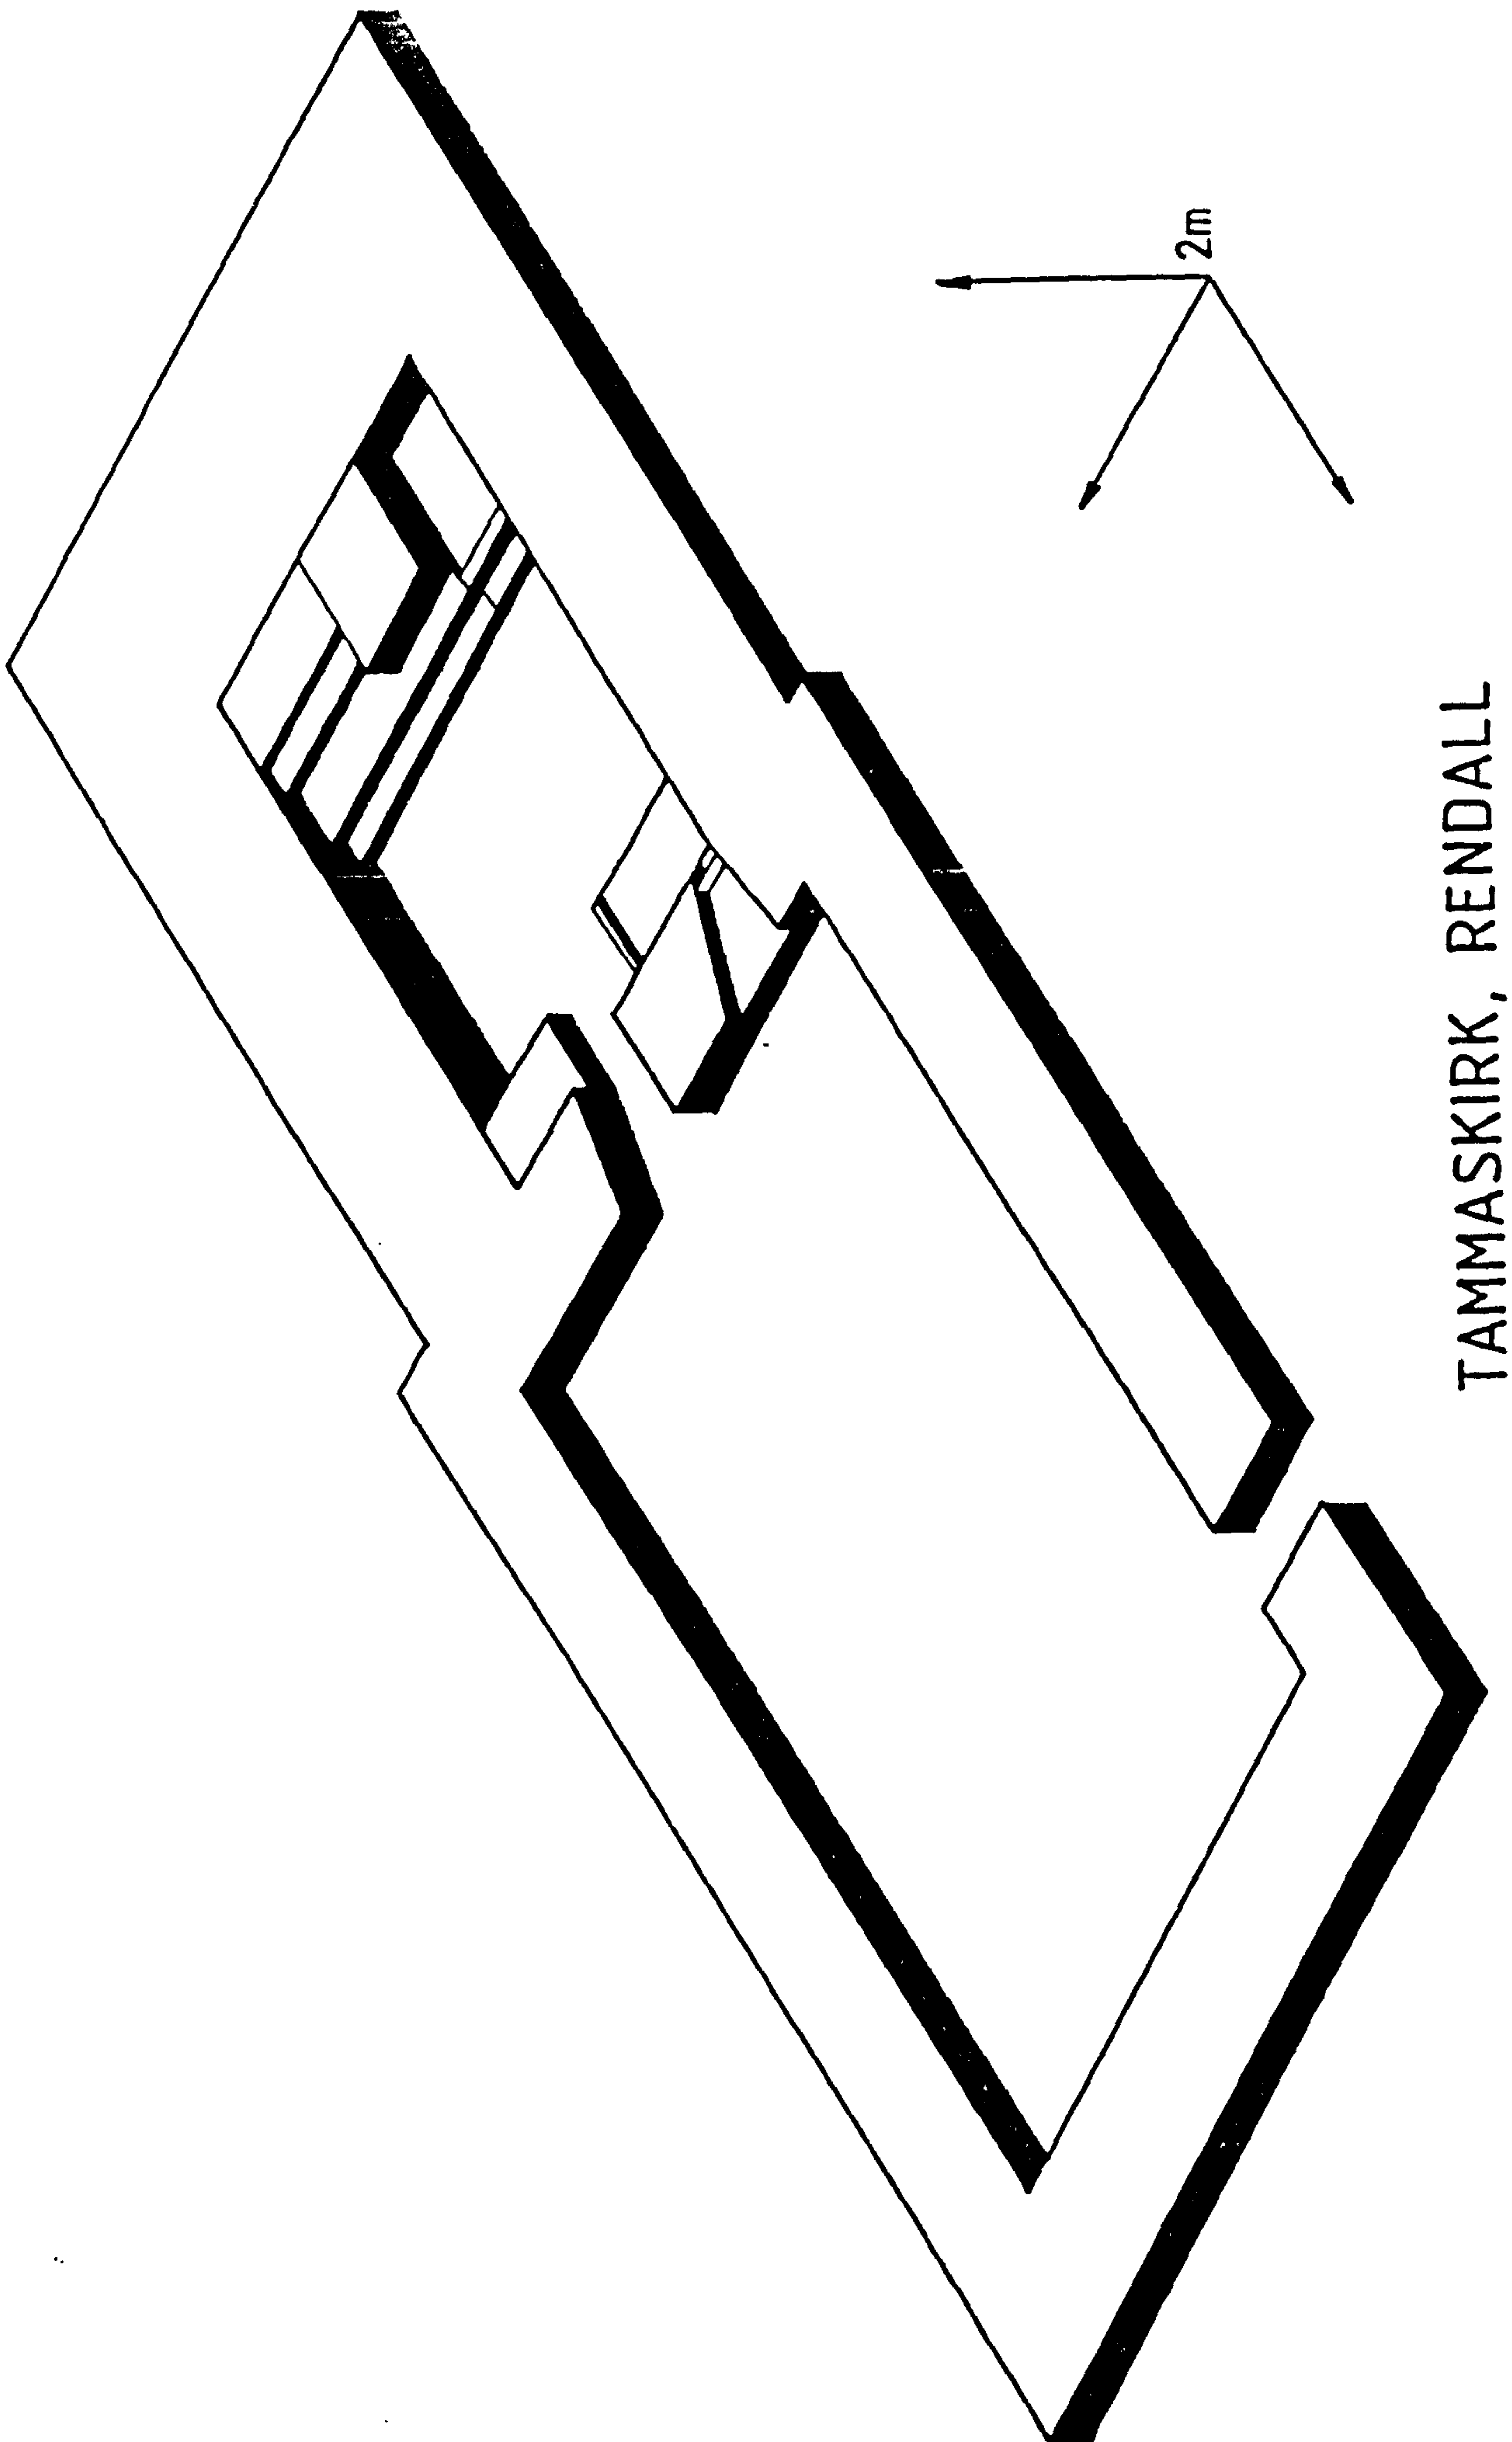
Isometric reconstruction of ground plan of Tammaskirk, Rendall, Orkney (after Clouston 1932b)
